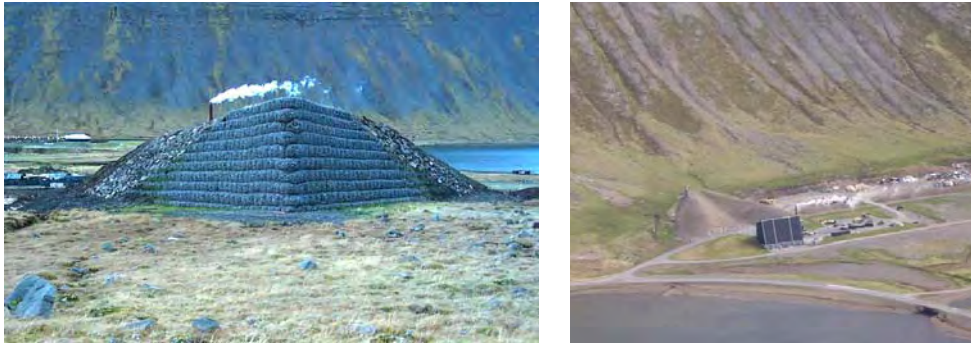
Deflecting dams in Engidalur, Ísafjörður. The dams form a wedge shaped structure (photos: Hallgrímur D. Indriðason).
